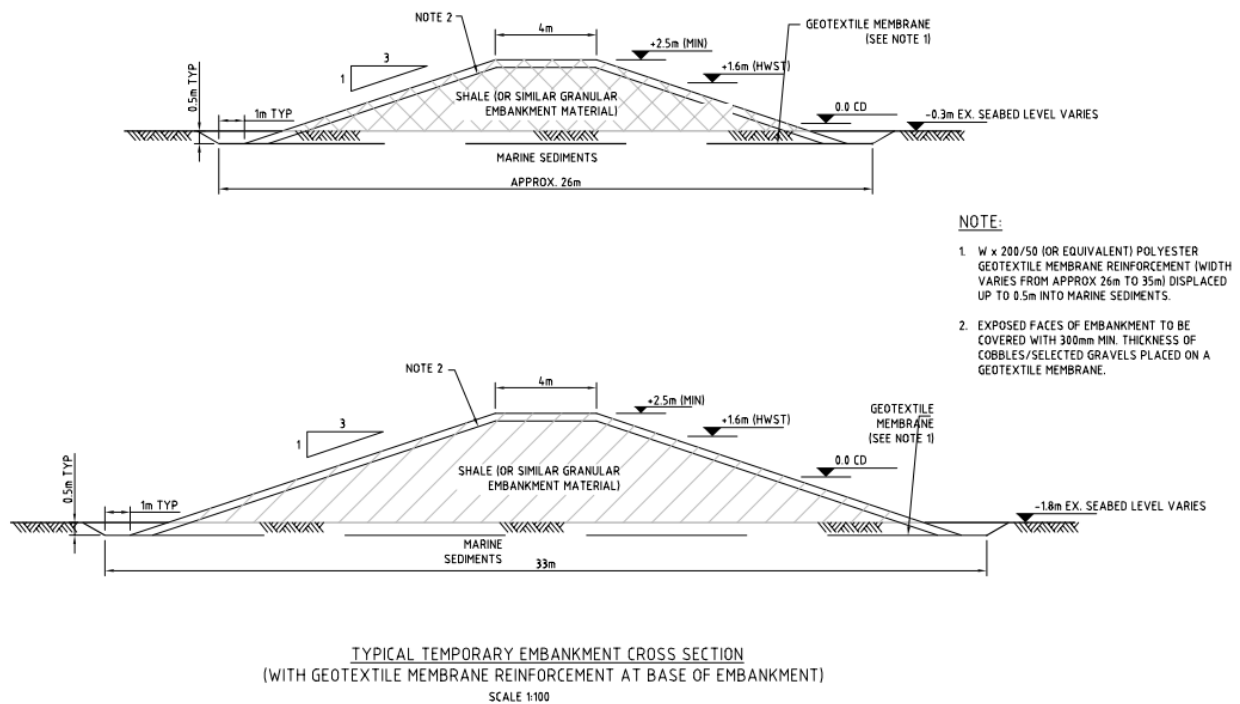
Typical cross section of reinforced embankment in line with original approval.
